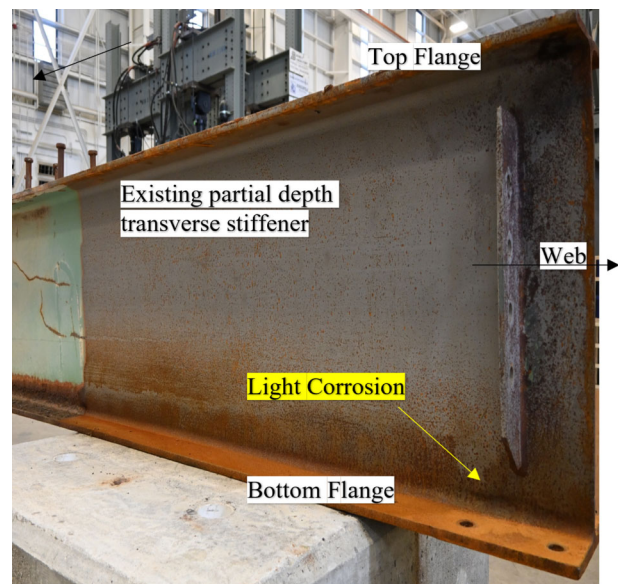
Specimen 6 girder with light corrosion.
